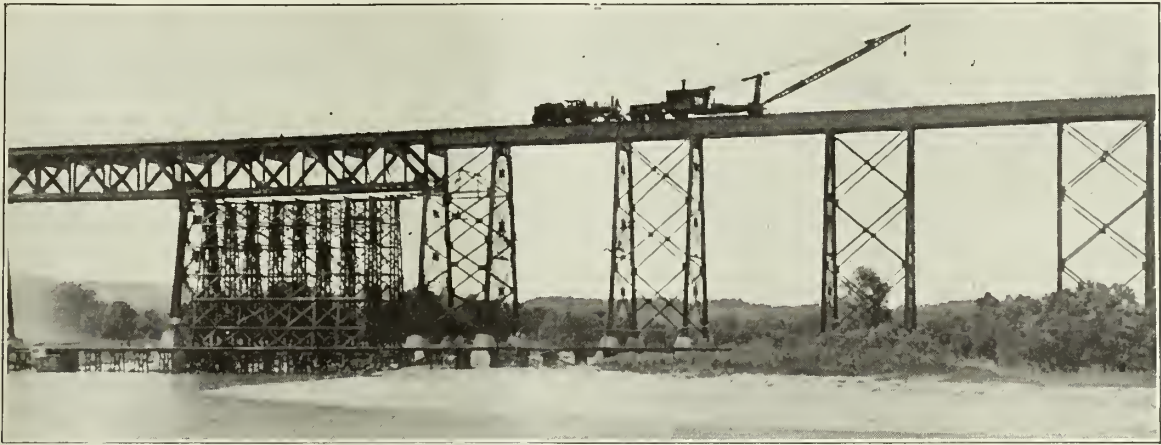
View Looking North, Showing Truss Spans with False-work for East Span Still in Place, Des Moines River Viaduct.
